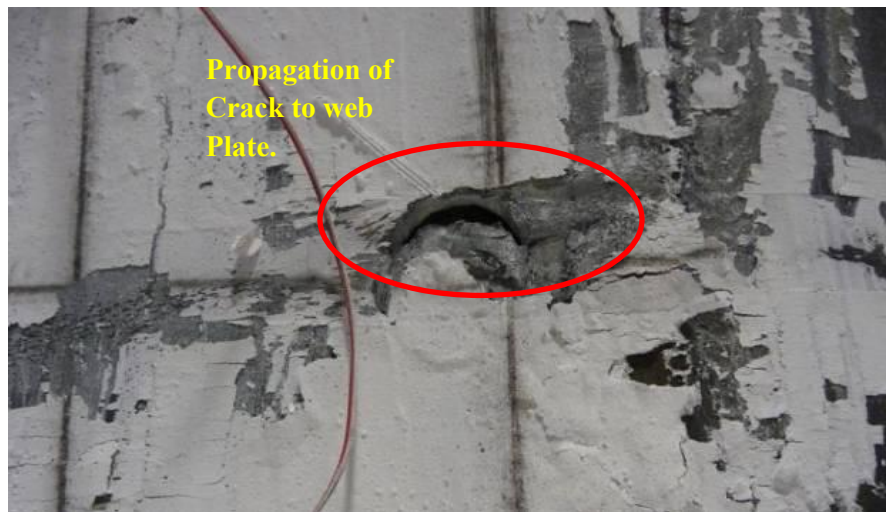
Propagation of Cracks in the Steel Web Specimen CFSSP-NB2 at 2.4% Drift
